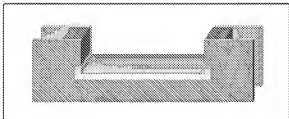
The Astropan is an inexpensive 3-piece sill pan that can be used under windows or doors.
